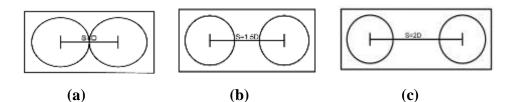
Pile group arrangements for 2 Piles with spacing between piles (a): S=D, (b) =1.5D and (c) =2D
